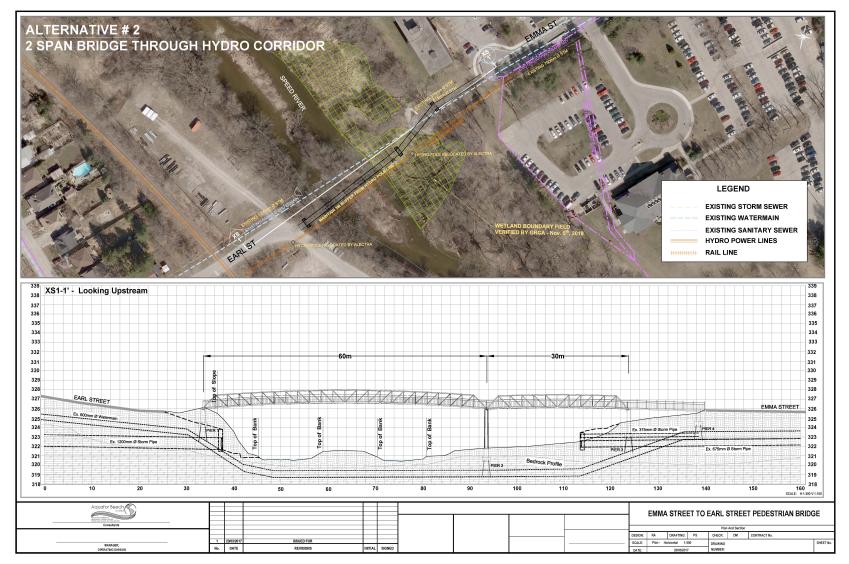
Alternative 2 - Two Span Box Truss Bridge Through Hydro Corridor, with Abutments in Cultural Woodland and Wetland.
